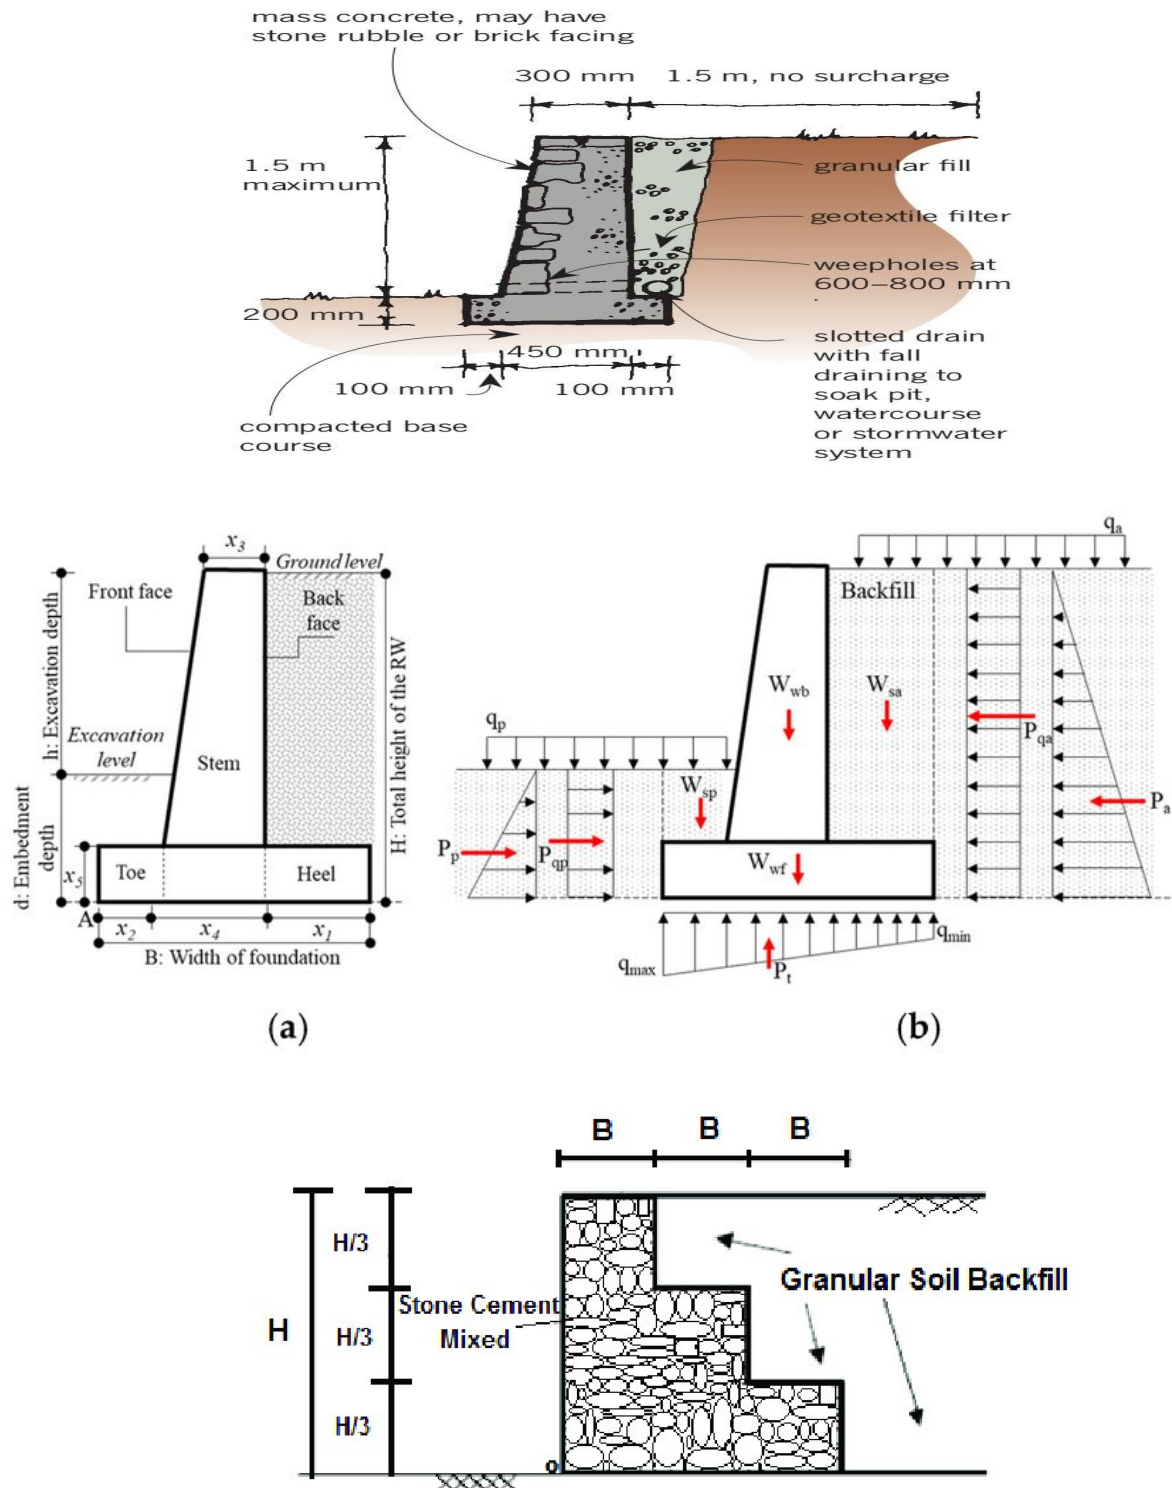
Typical Section of Gravity Retaining Wall
